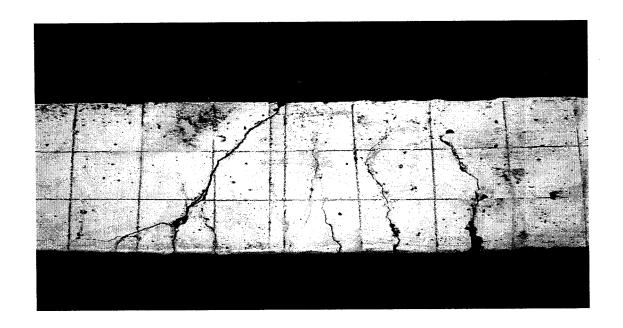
Crack pattern of beam without web reinforcement (WOWR1)
